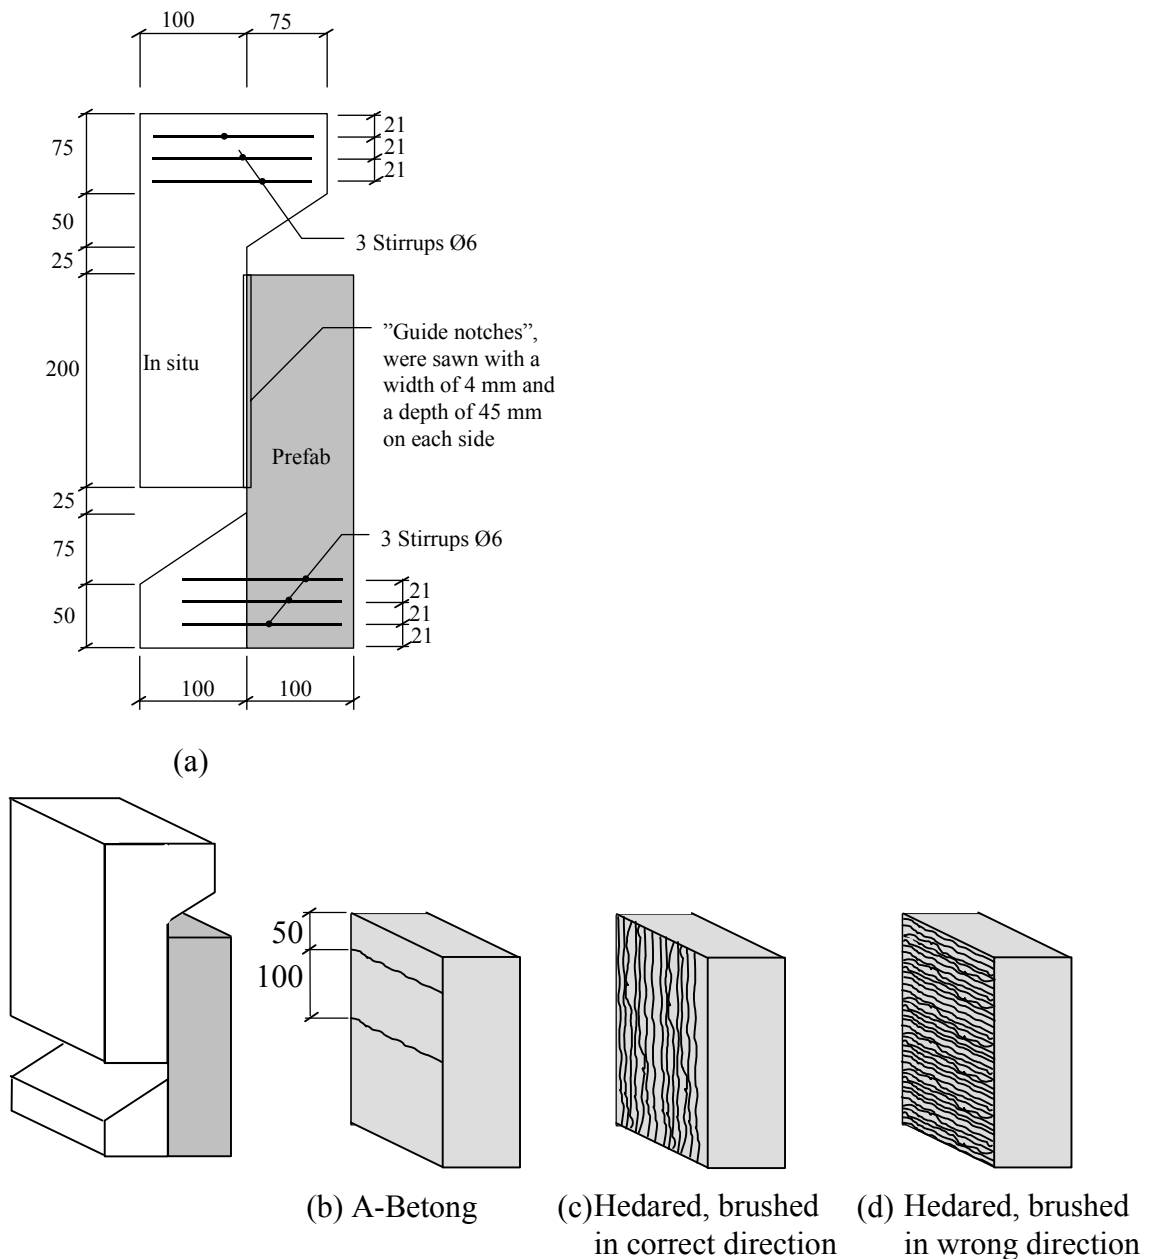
Geometry of shear test specimens, (a) whole specimens; (b-d) treatment of surface of prefabricated concrete.
